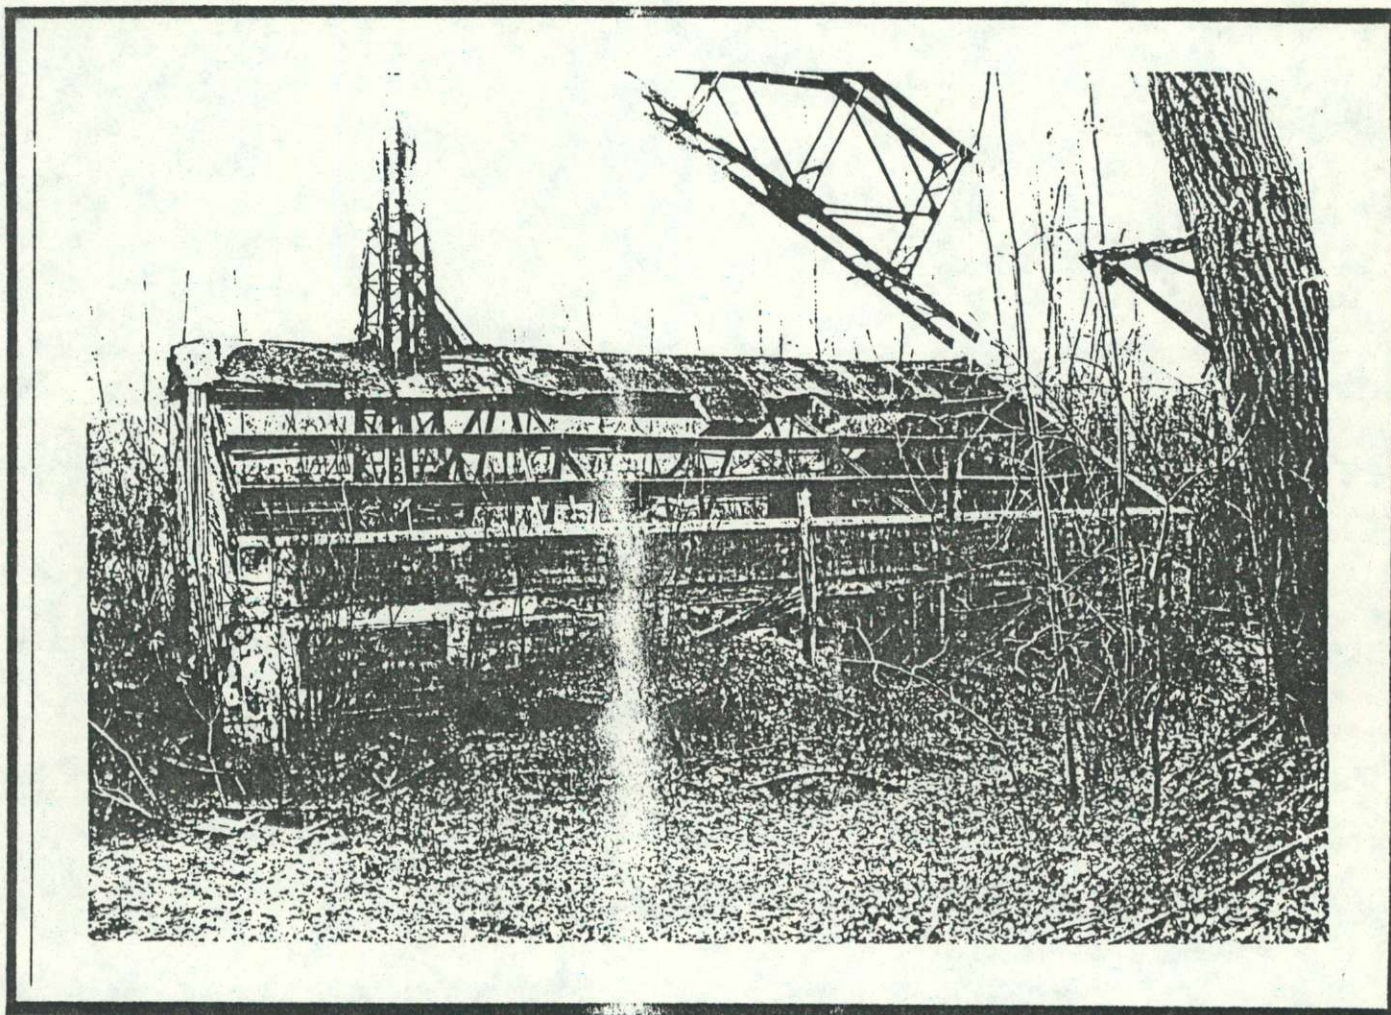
Hoist House, Showing Portion of Conveyor Framework and Support Tower;
